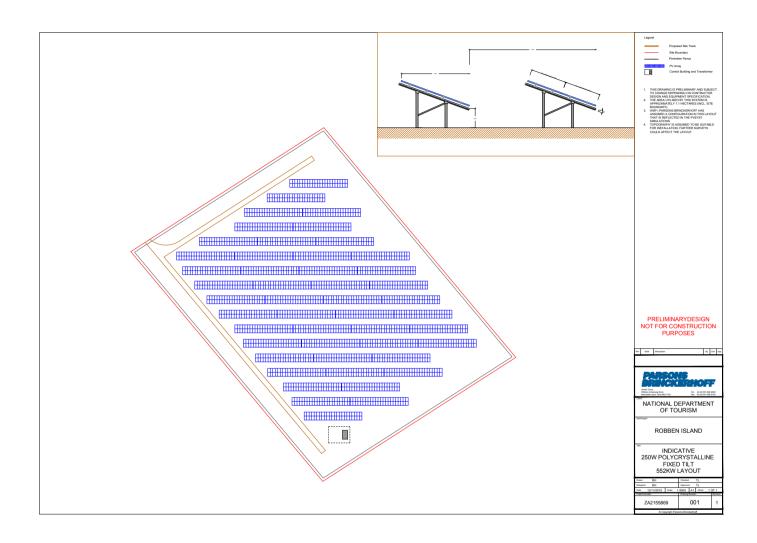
Proposed layout of solar panels with all panels facing north on site (WSP|PB January 2016)
